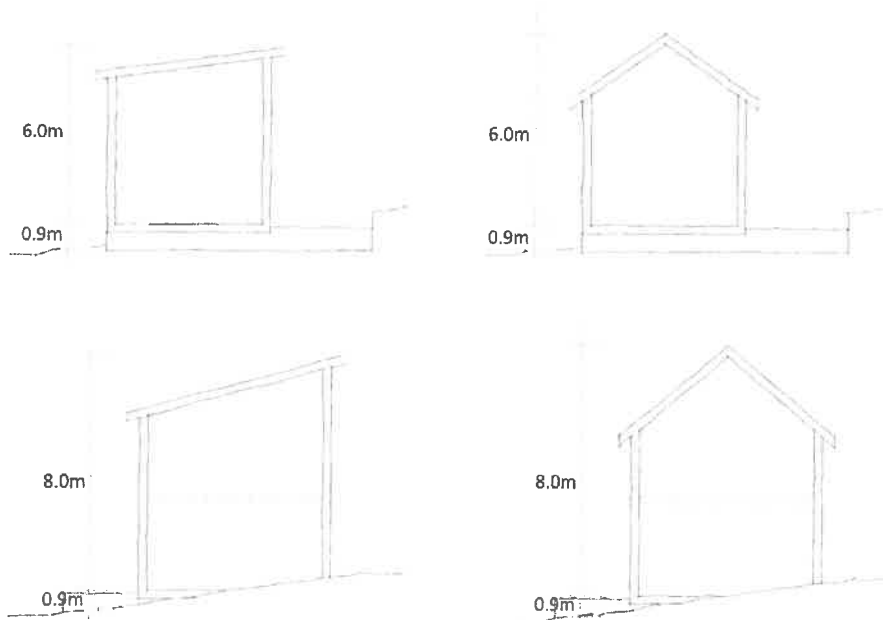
East Precinct Maximum Permissible Building Height
